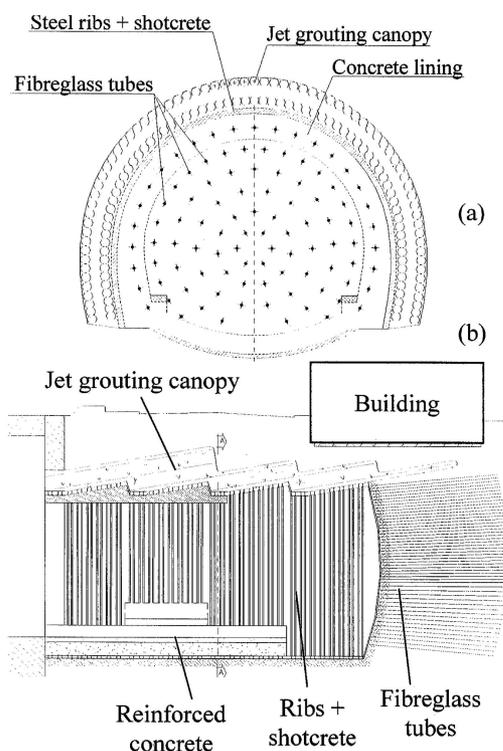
Construction details of jet-grouted canopy and face reinforcement (a) in cross-section and (b) longitudinally for the Florence tunnel (Russo and Modoni).
